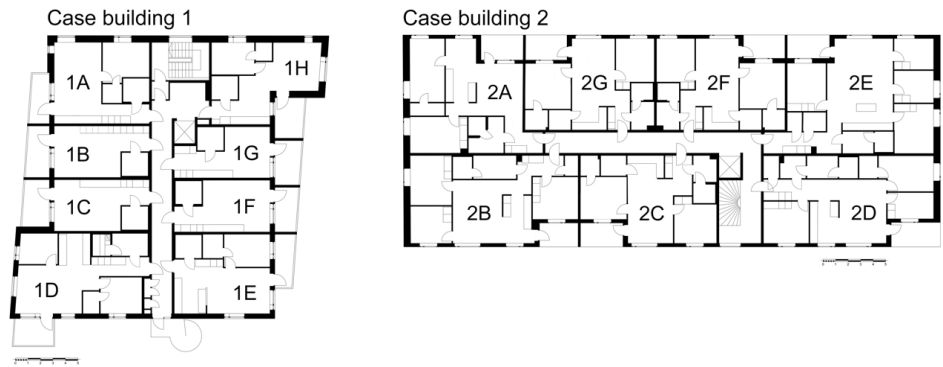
Case buildings 1 and 2 typical (recurring) floor plans, both located in Turku.
